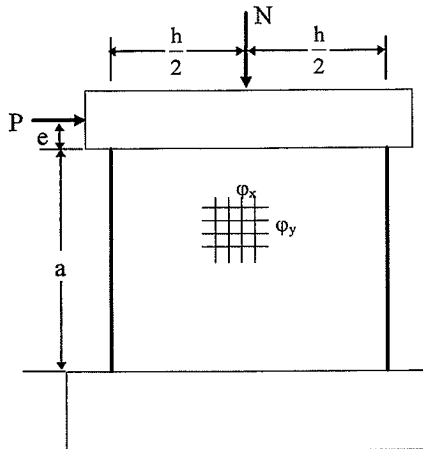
Shear wall with web reinforcement loaded by transverse as well as normal forces
